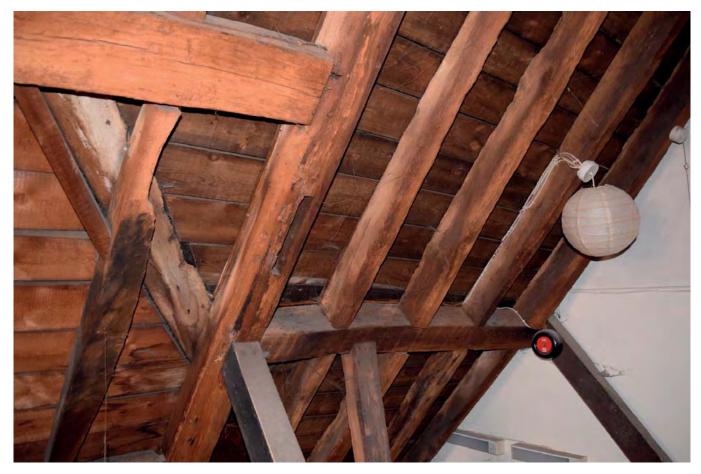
Mortice in principal rafter of easternmost truss (Truss 6)
